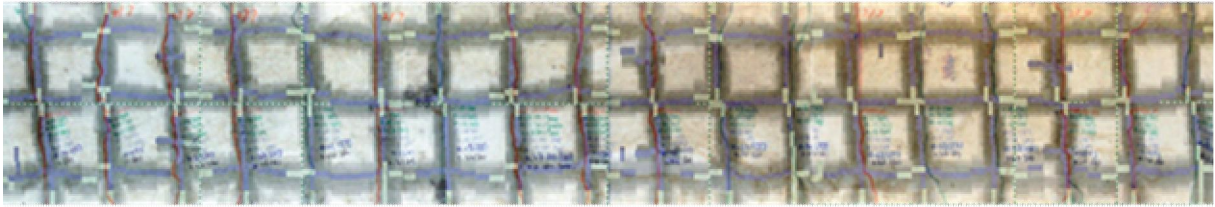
Formwork and reinforcement of test specimens in Series-3
